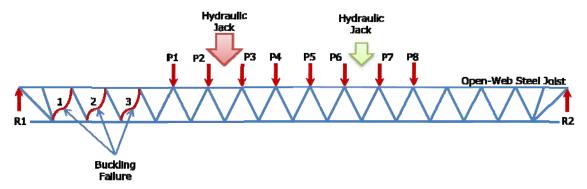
Schematic of Buckling Failure: Specimen No.2
